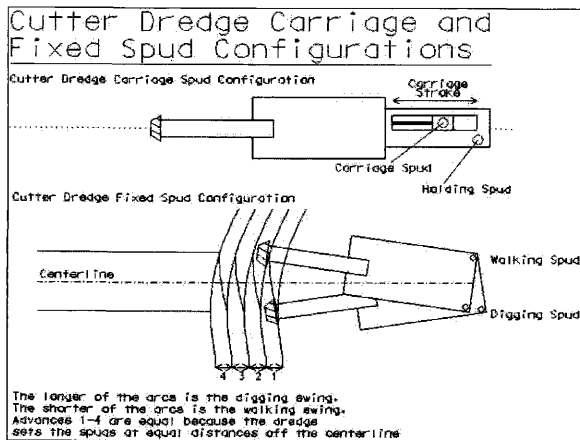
Cutter Dredge Carriage and Fixed Spud Configurations
